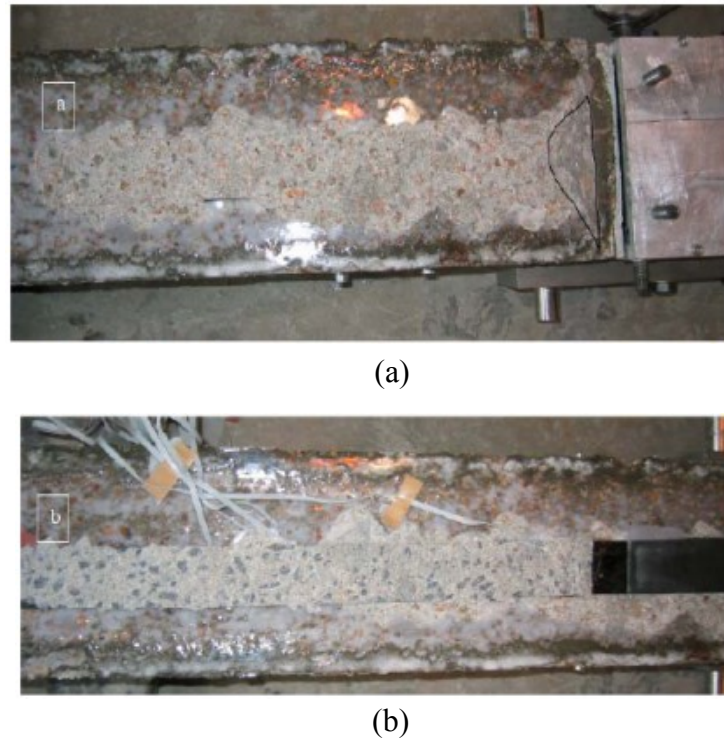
(a) The damaged surface of the concrete block (b) the debonded FRP plate with a thin layer of concrete on the surface from Pan and Leung (2007)
